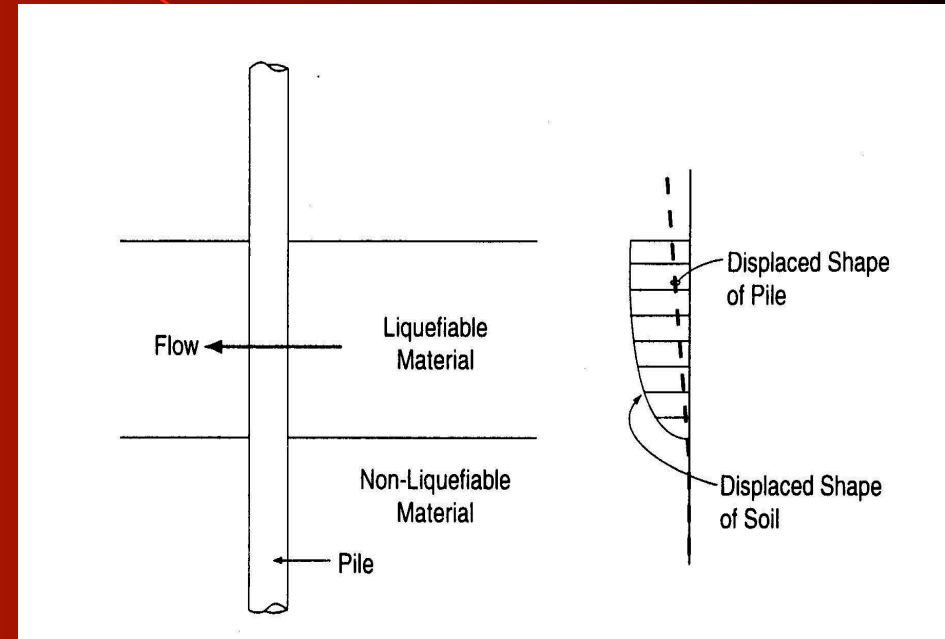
Site and Damage Characteristics for a Precast Concrete Pile Subjected to a Lateral Spread in the Kobe Earthquake
